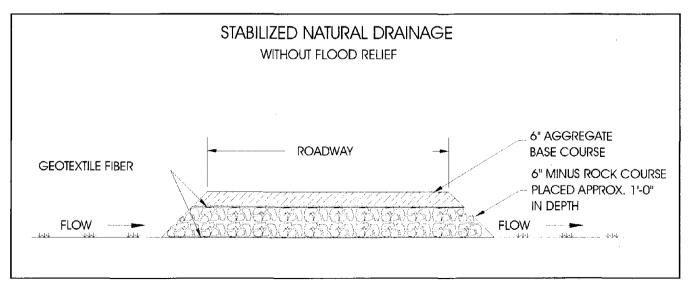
Typical Drawing: Stabilized natural drainage without flood relief.
